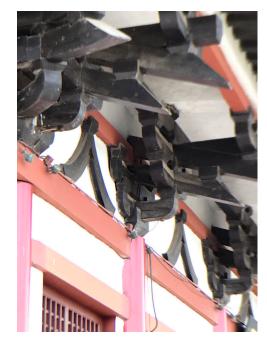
Bracket detaching from the concrete wall, Zhong-hua Temple, Shenyang, Liaoning, China
